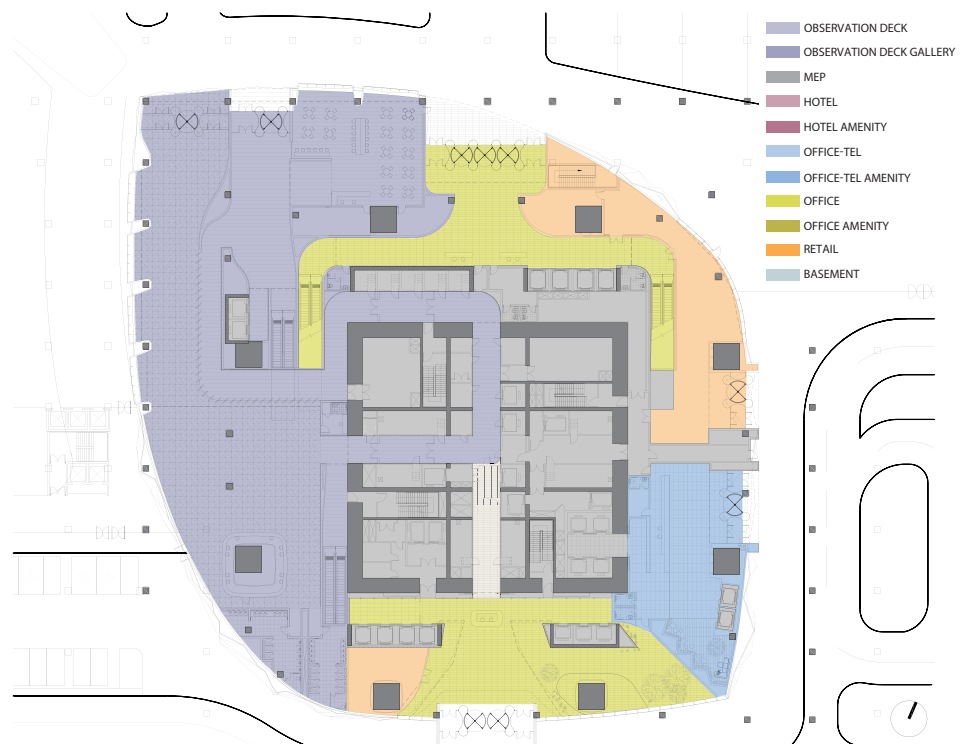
Level B1 plan, showing location of drop-off zones and zoning.
